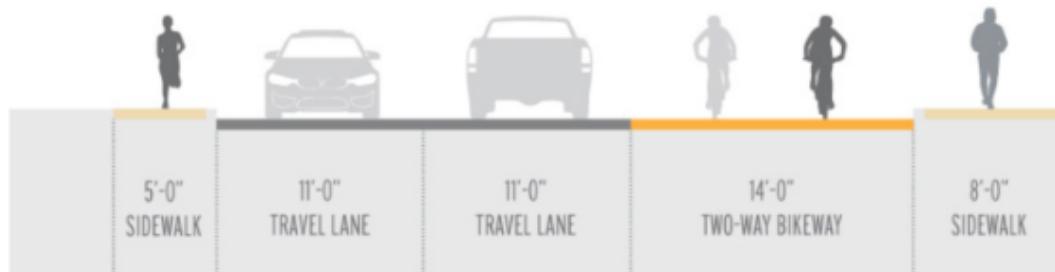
Hawthorne Avenue Concept 2A: Cross Section B
